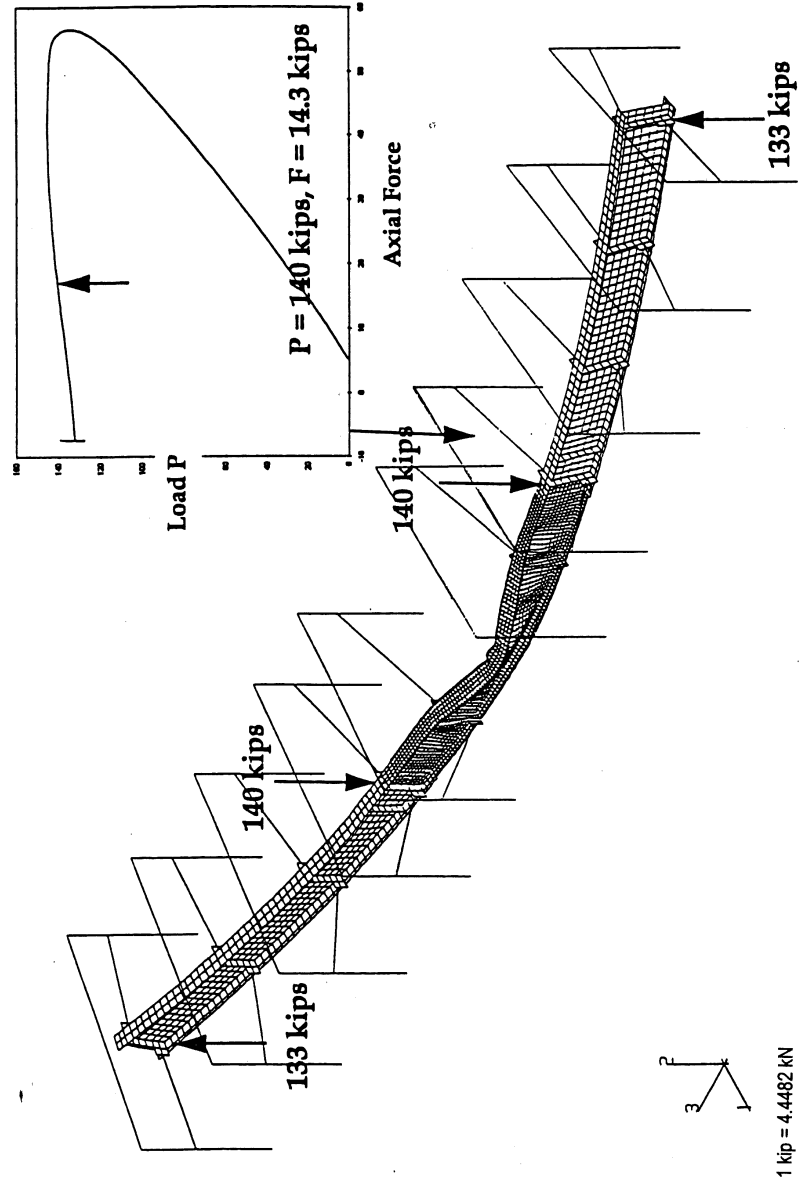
ABAQUS Model of Single Girder Test Set-Up
